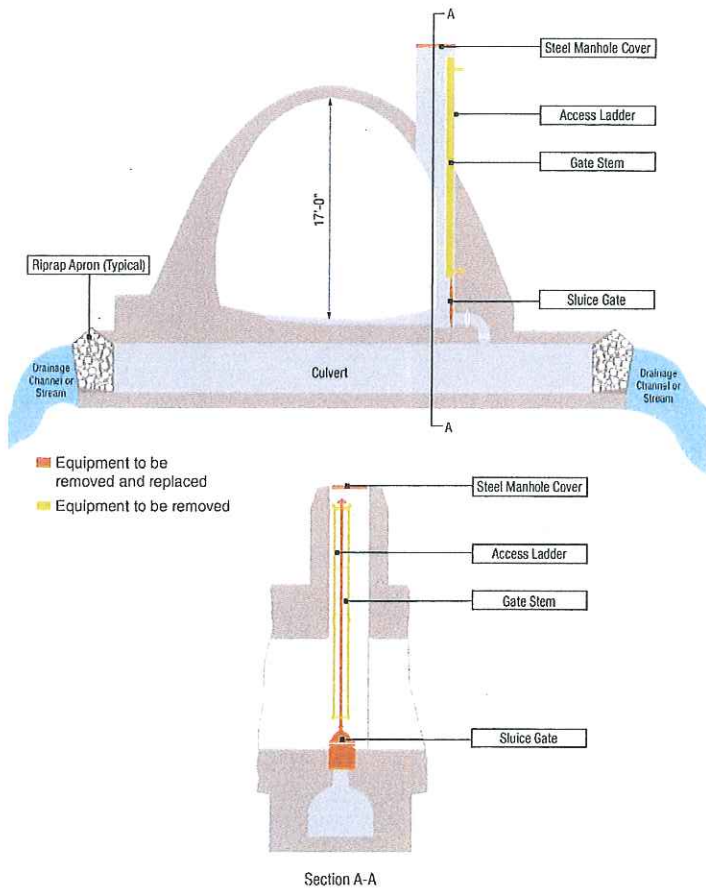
Culvert Drain Sluice Gate Repairs
